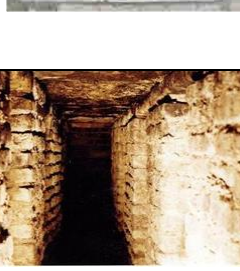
Channel in the southern wall between towers 3 and 4 (Author, 2025).
